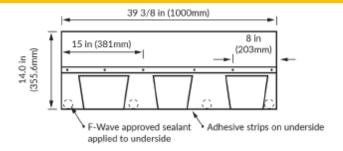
REVIA ROOFING SHINGLE STARTER PIECE
